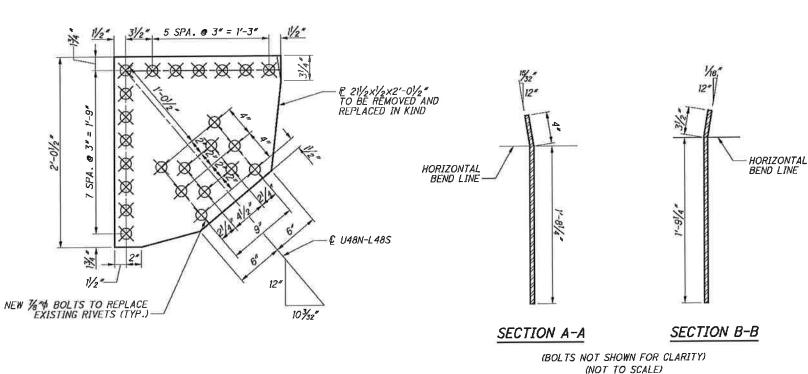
WEST CONNECTION & WEST ELEVATION
